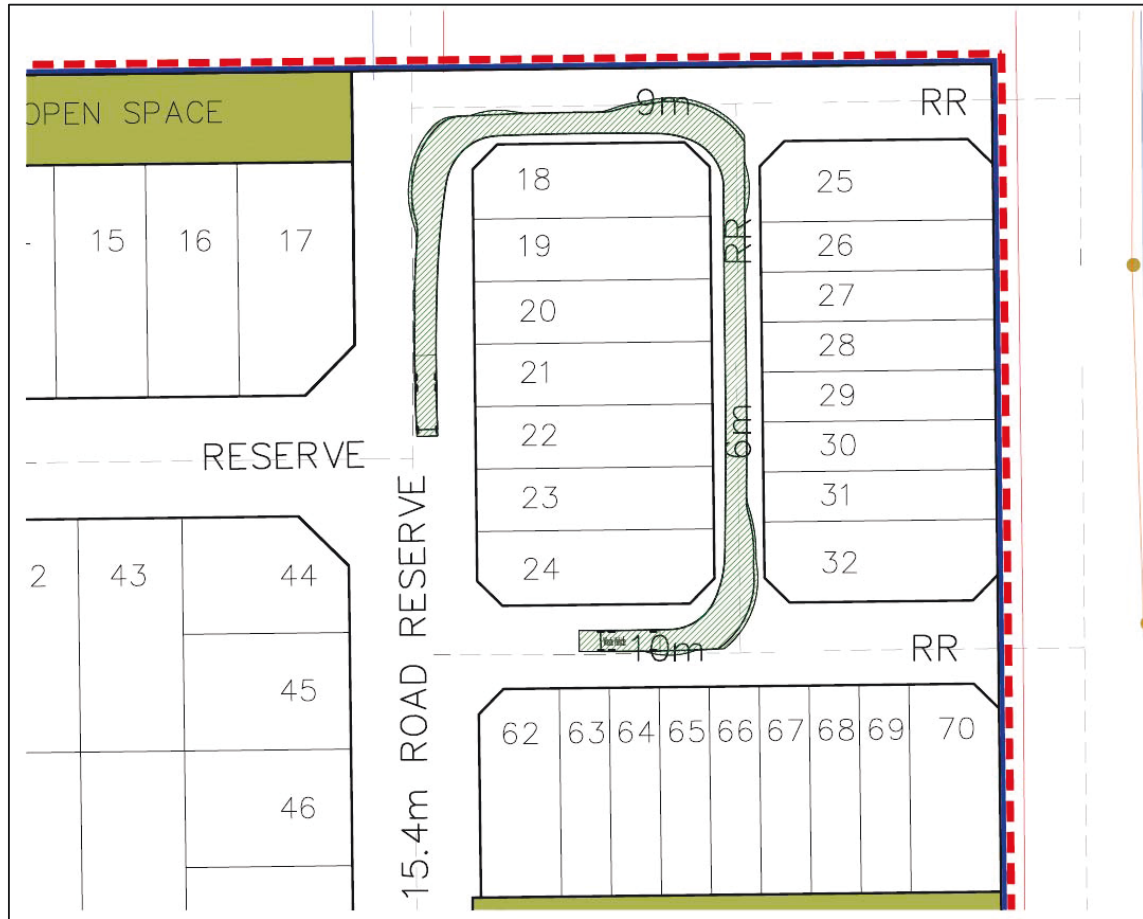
AutoTrack Assessment - 9.7m Waste Vehicle - Through Laneway from Access Road
